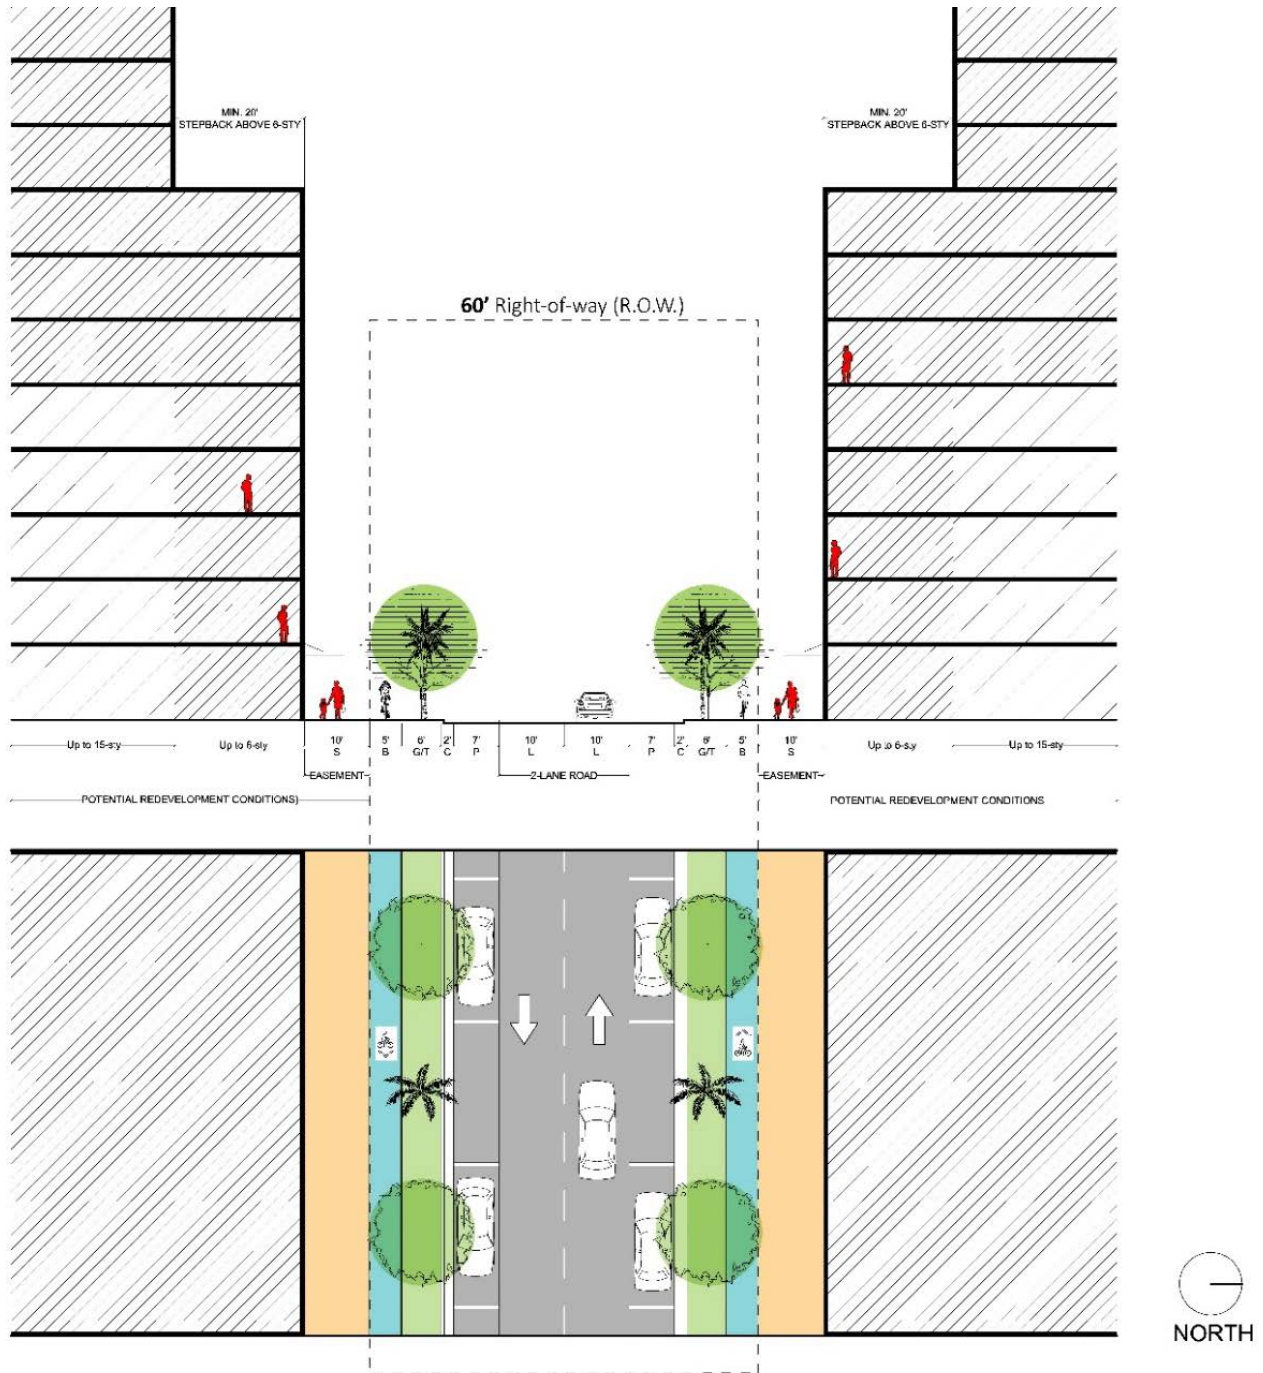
F.7: Secondary/Greenway Streets with Parking Street Design
